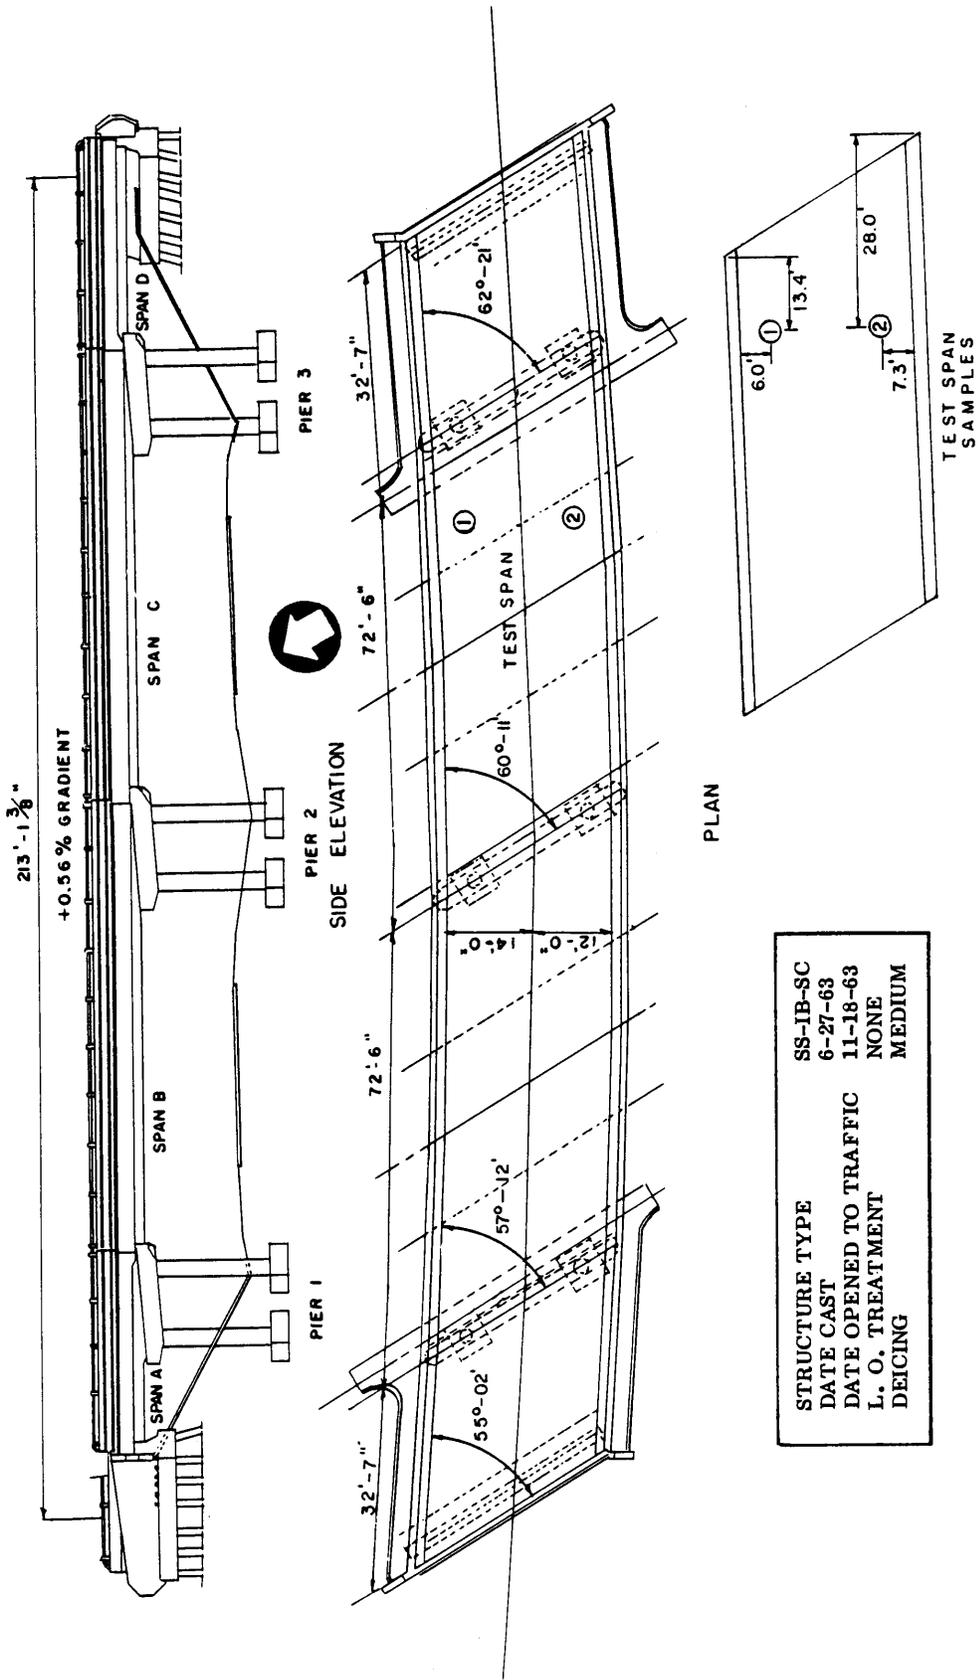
Plan for bridge #8; also shown are the locations of test samples.
